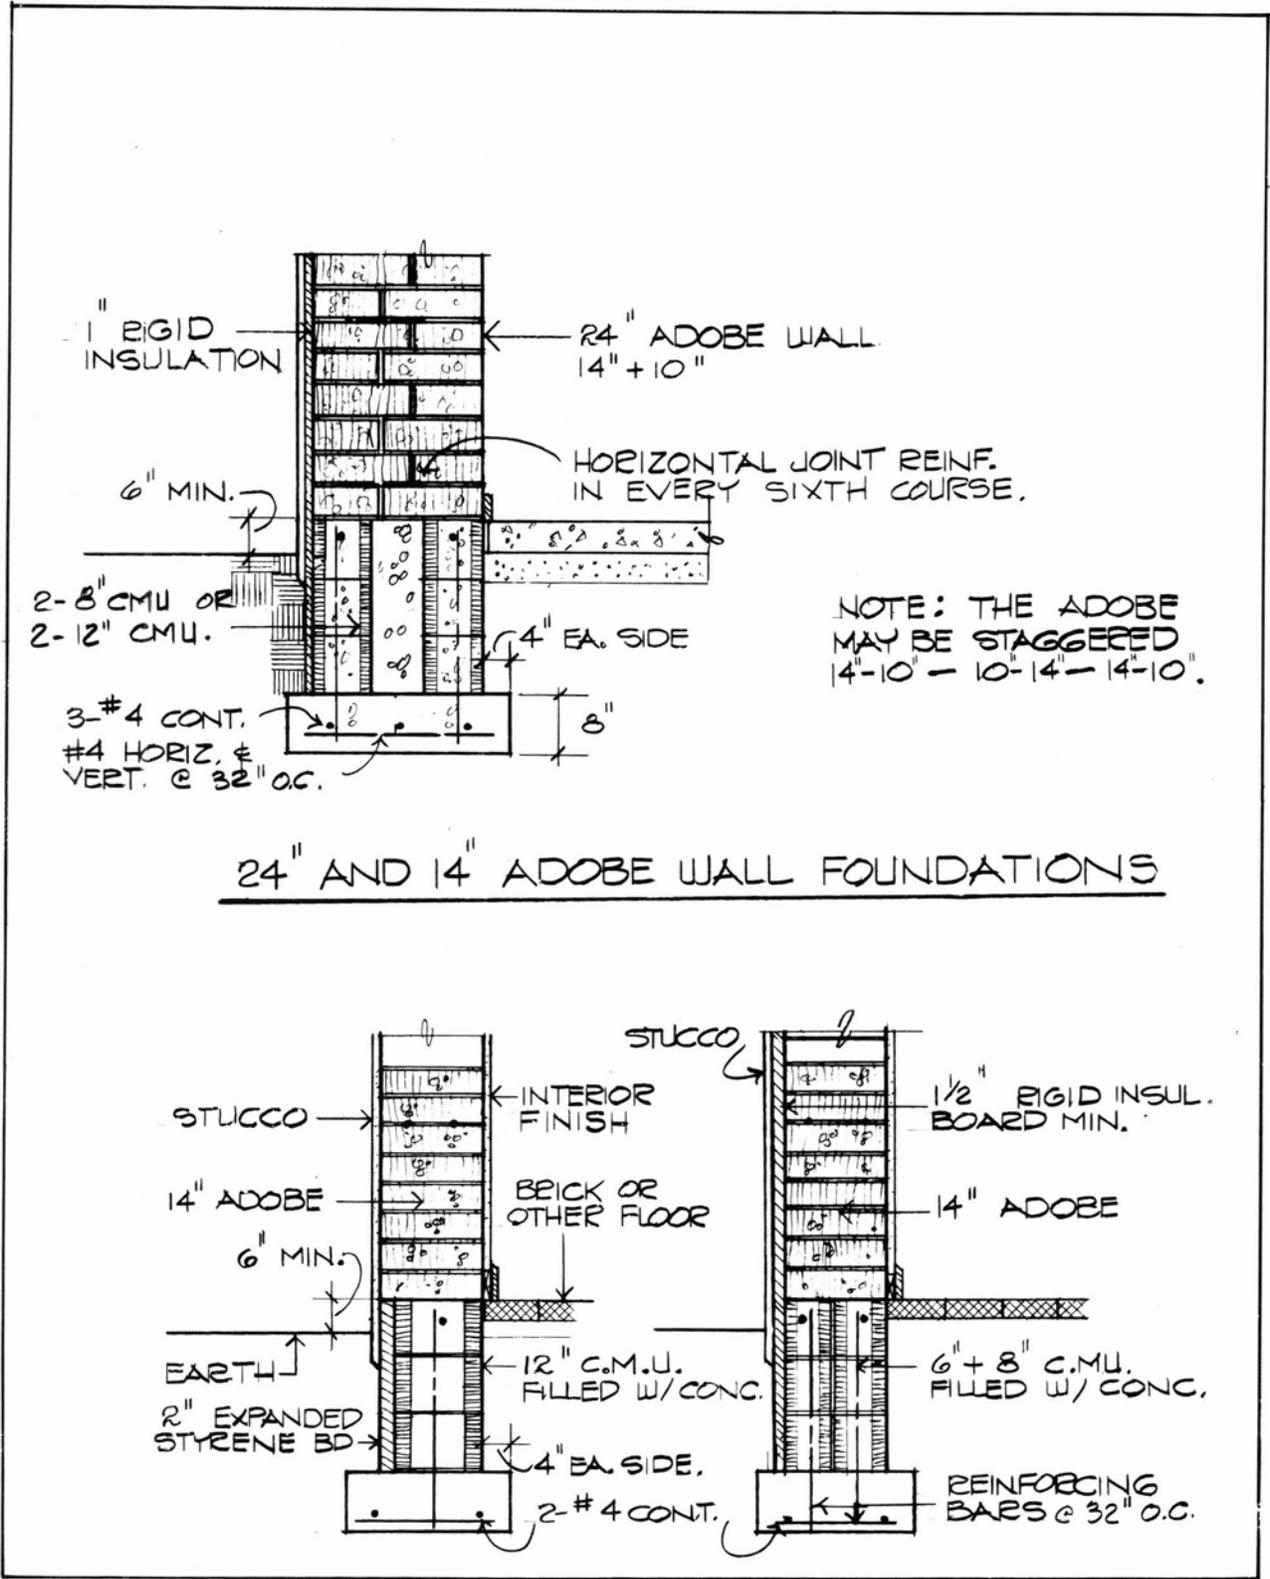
Typical foundation for 14-inch and 24-inch walls.
